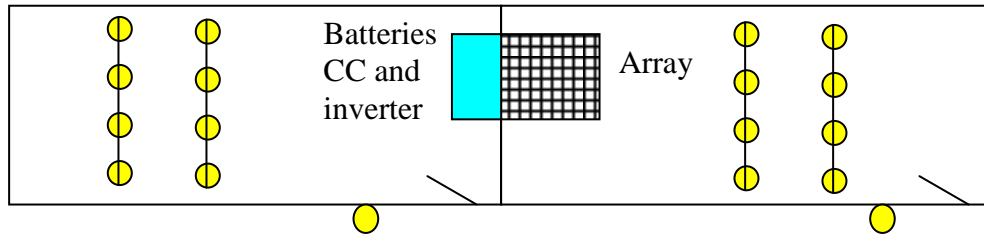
7: System 1 – Typical Design Layout for Lighting in a Standard Classroom School Block. Source: CRED (2009)
